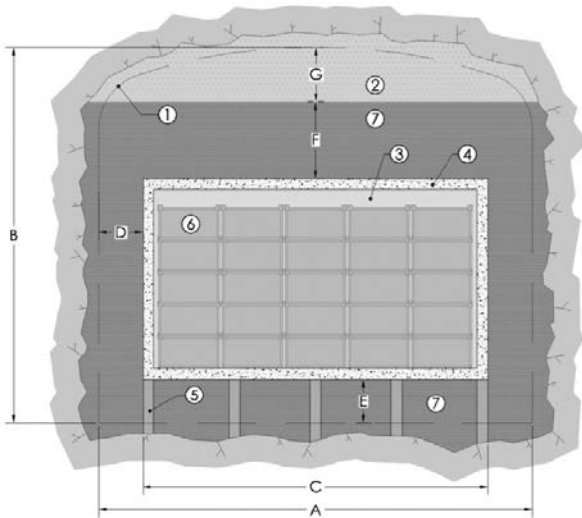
Schematic cross-sectional layout of BHA (from Elfving et al. 2013). Legend: 1.) Theoretical tunnel contour. 2) Bentonite pellets. 3) Grout. 4) Concrete structure (0.5 m). 5) Granite pillars. 6) Waste packages. 7) Bentonite blocks. The outermost grey area represents the rock. Approximate dimensions: $A = 20.6$ m, $B = 18.5$ m, $C = 16$ m, $D = 2.3$ m, $E = 2.4$ m, $F = 4$ m, $G = 3.7$ m.
